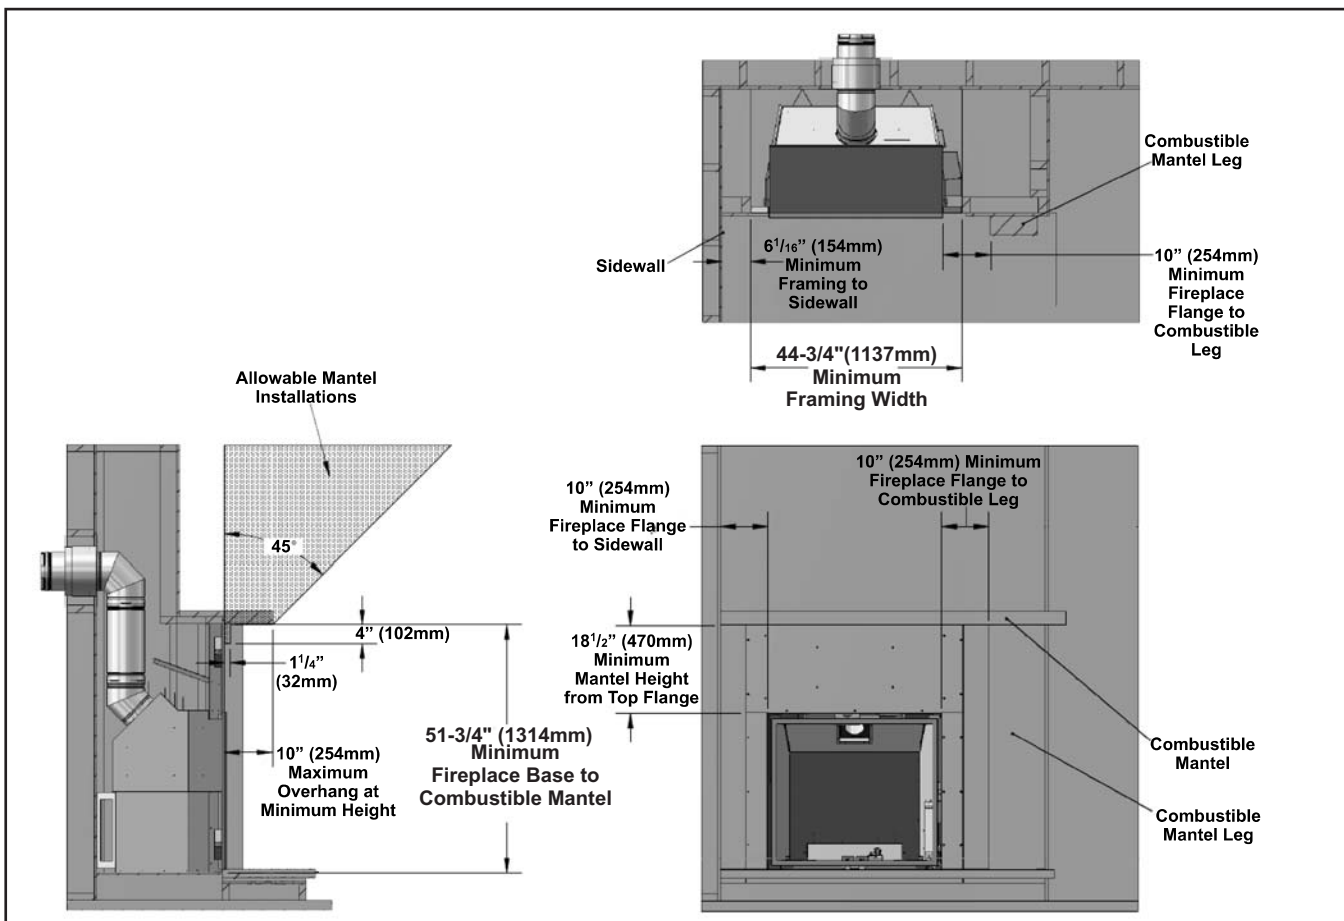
Typical Framing for Sidewalls & Mantel - Detailed.
